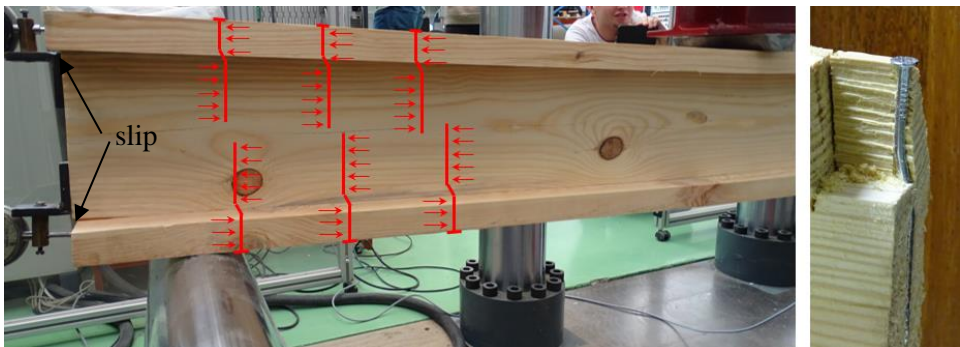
Composite double-T beam deformation and the fastener deformation. Source: Author's archive
